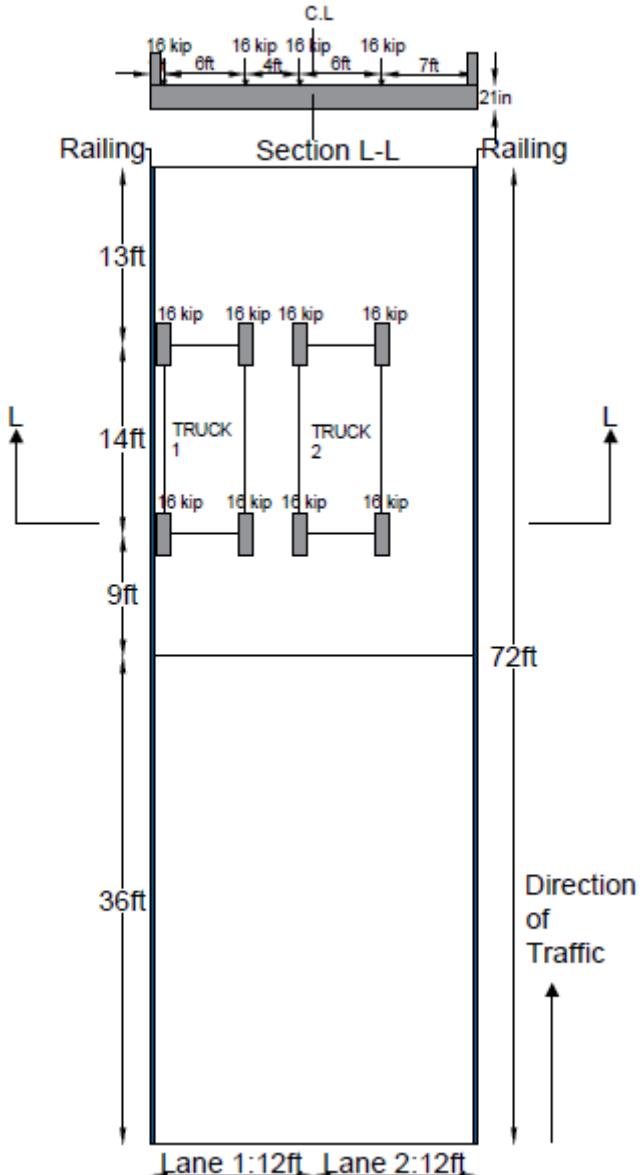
Typical Cross-Section and Plan of a Two-Lane 36ft straight Bridge with One Railing(Right) under Edge Loading (Negative moment).
